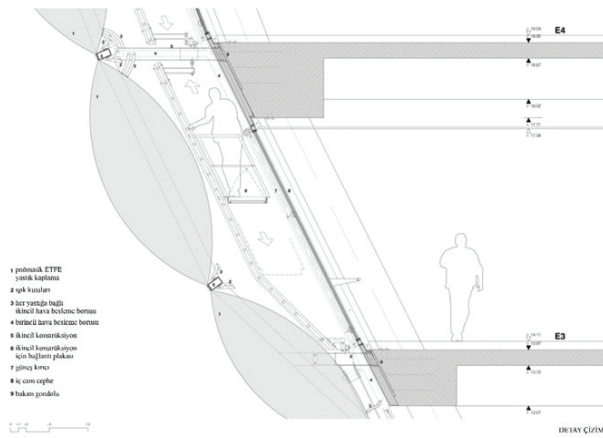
Section showing the facade detail of Allianz Arena (URL-21)
